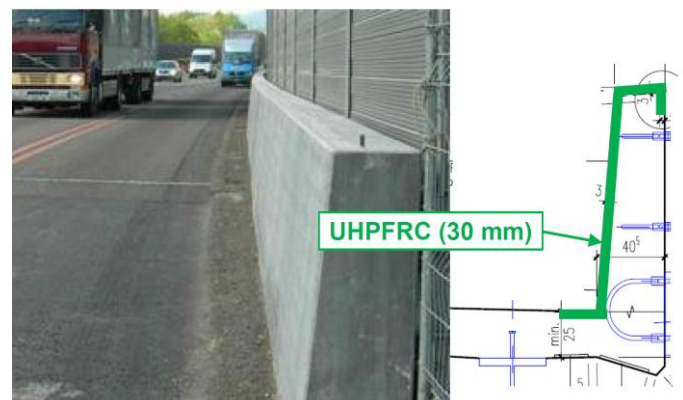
Typical cross section of the crash barrier wall and view after rehabilitation.
